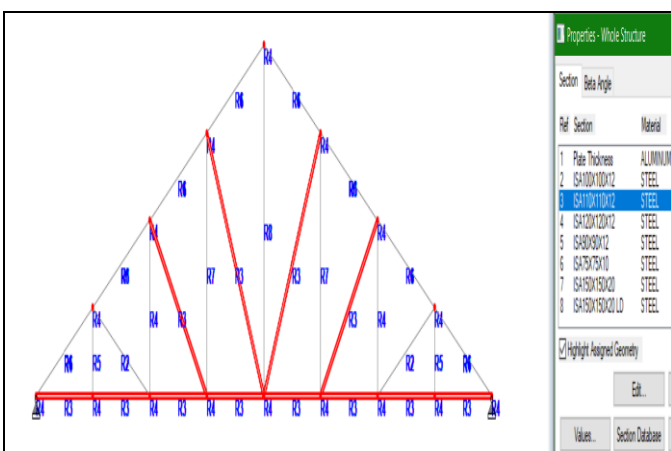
Property of Steel ISA 110 X 110 X 12 mm provided for above red colored Member of Steel Truss.
